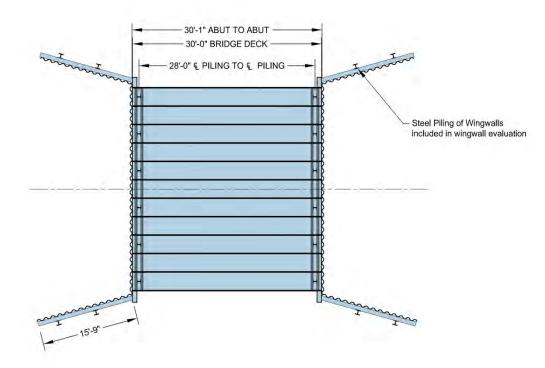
EI.24.2-2: Plan view of simple concrete slab bridge
